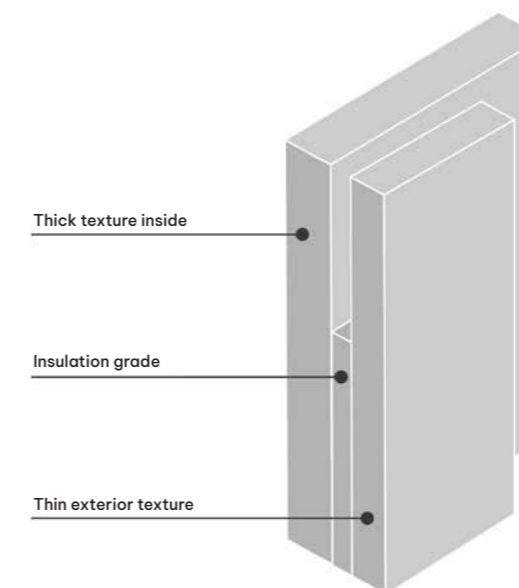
Wall structure (Source: Pham Thi Hai Ha, 2018)
